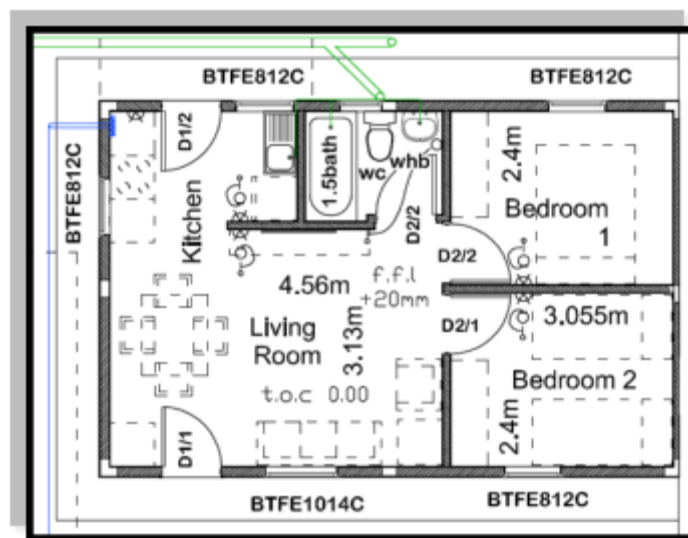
TYPOLOGY A & B - FLOOR PLAN
